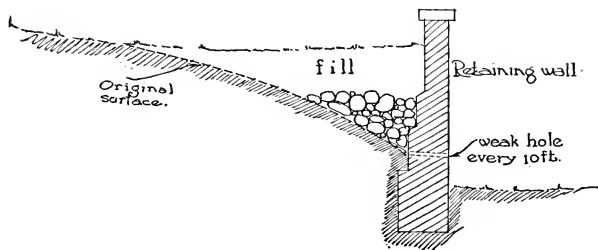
Section through a retaining wall and the soil it holds in place, to illustrate especially the “weak holes” provided at intervals to take care of the drainage
